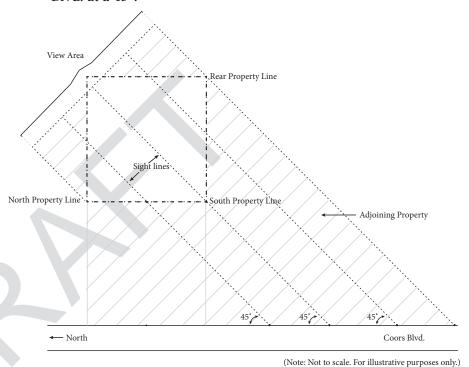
Sight Lines and View Area for a Site off Coors Blvd. – Plan View
